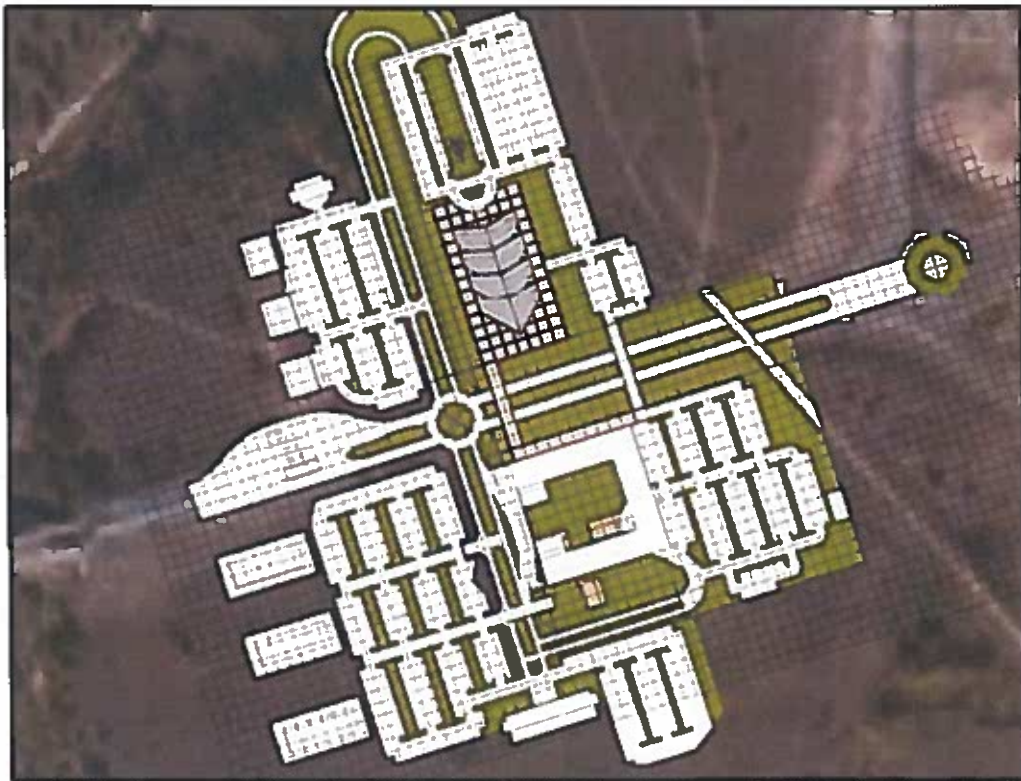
Proposed Visitor Center Complex site plan organization on the 28-foot grid module.
